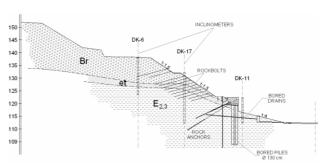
Cross-section of landslide with anchored pile-wall solution.
